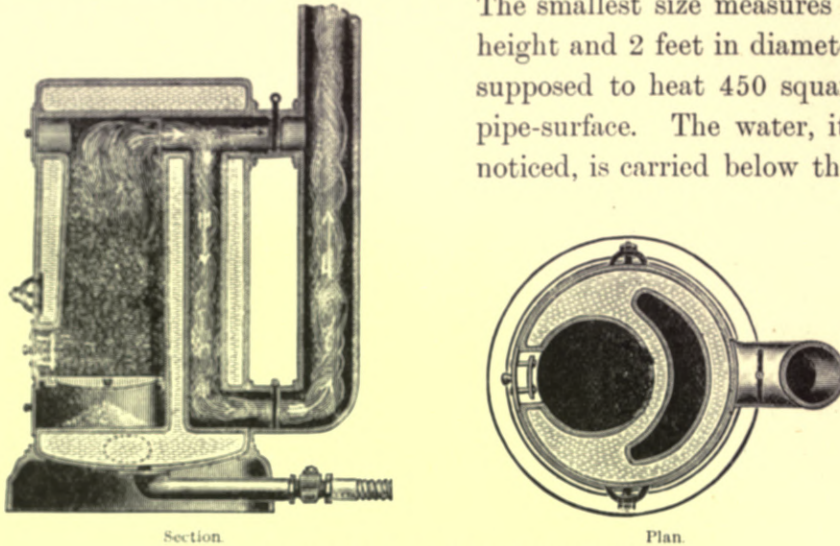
Plan and Section of the "Marlor" Boiler.
